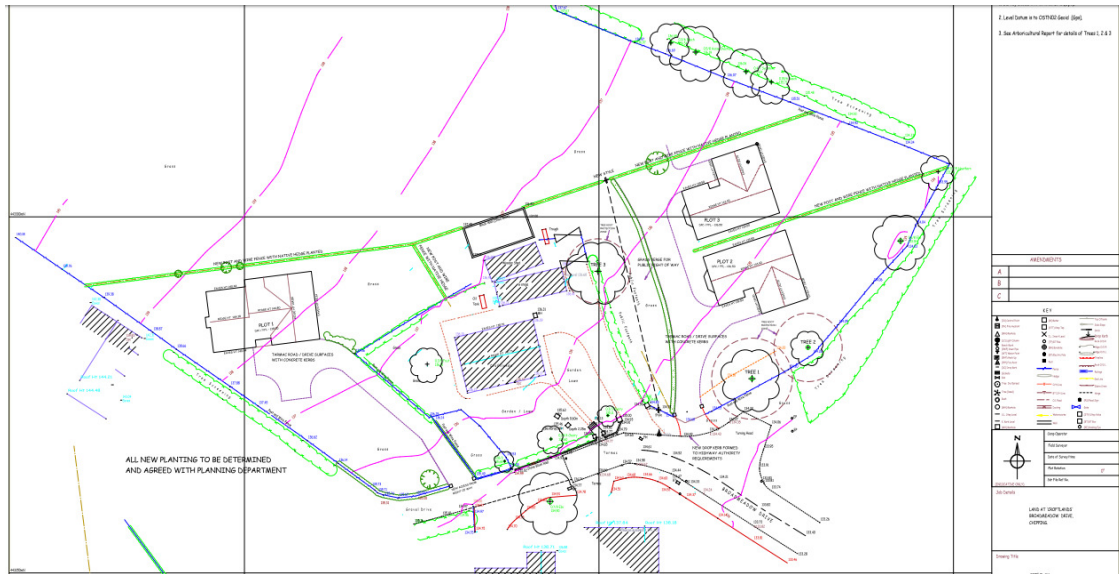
Extract of approved site layout plan for planning permission 3/2013/0571 (source: Ribbles Valley Borough Council online application database)
